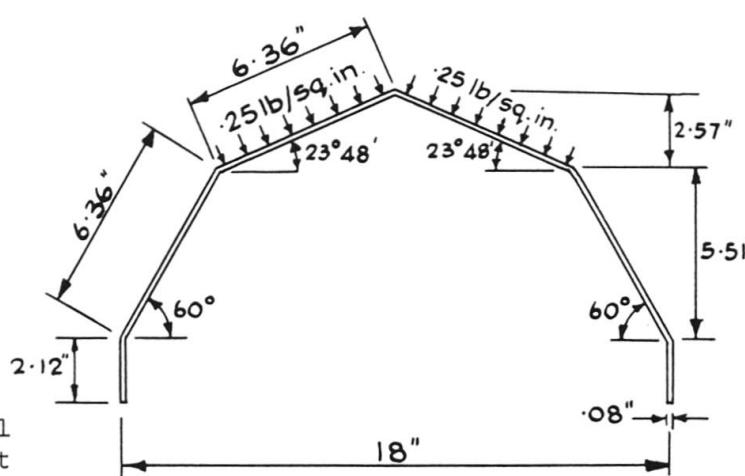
DETAILS OF VAULT-TYPE CROSS-SECTION
